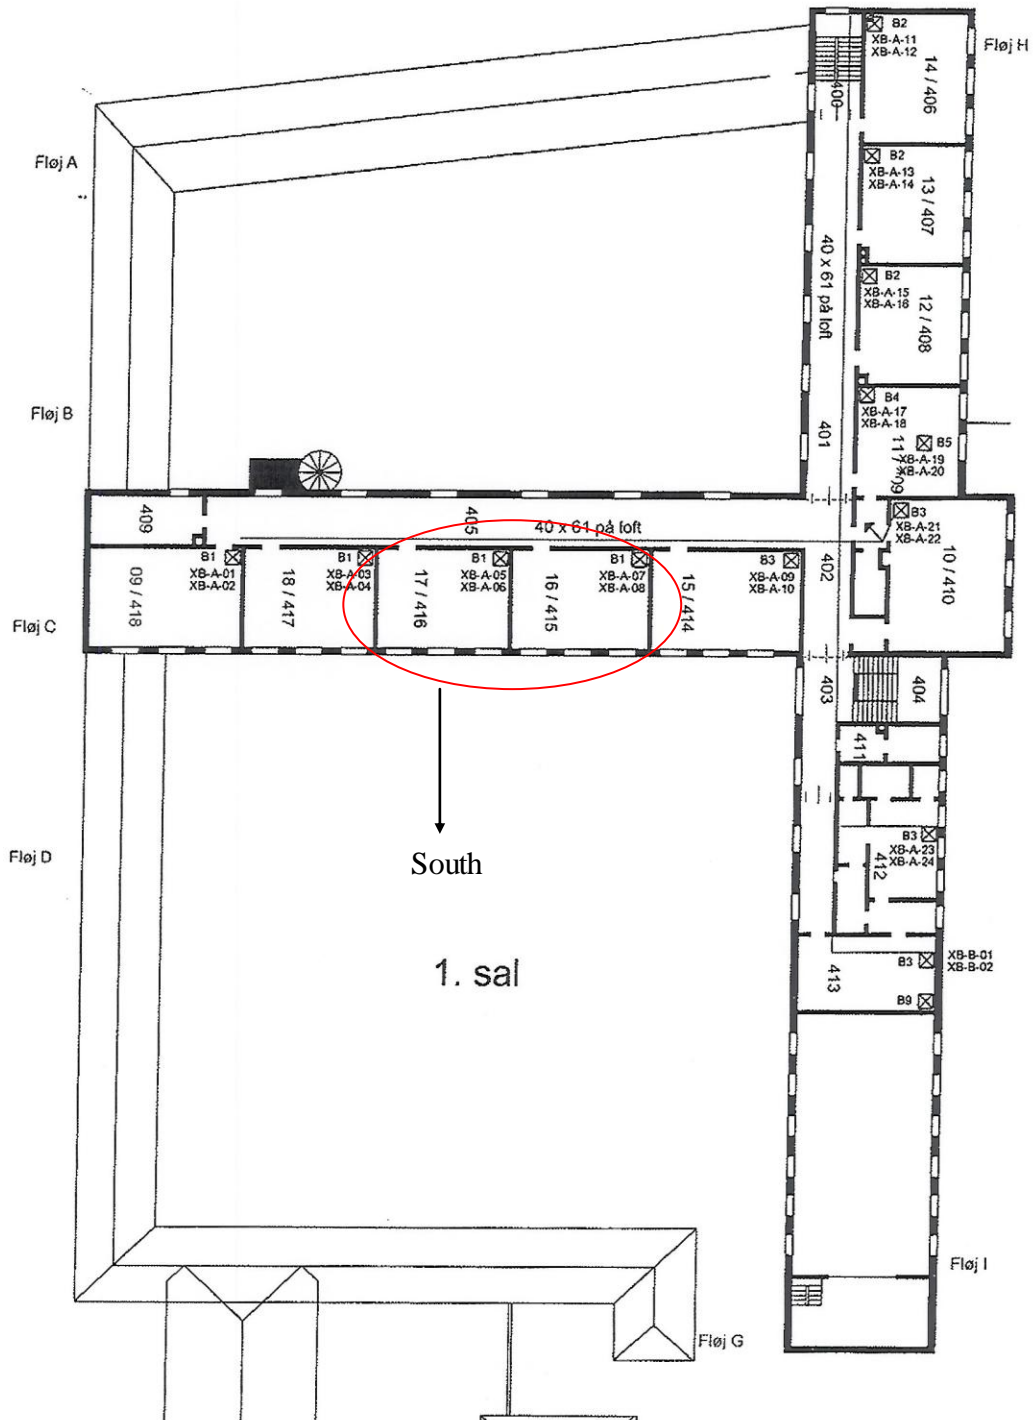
Plan over Malling school. The two considered class rooms is room 16 and 17.
